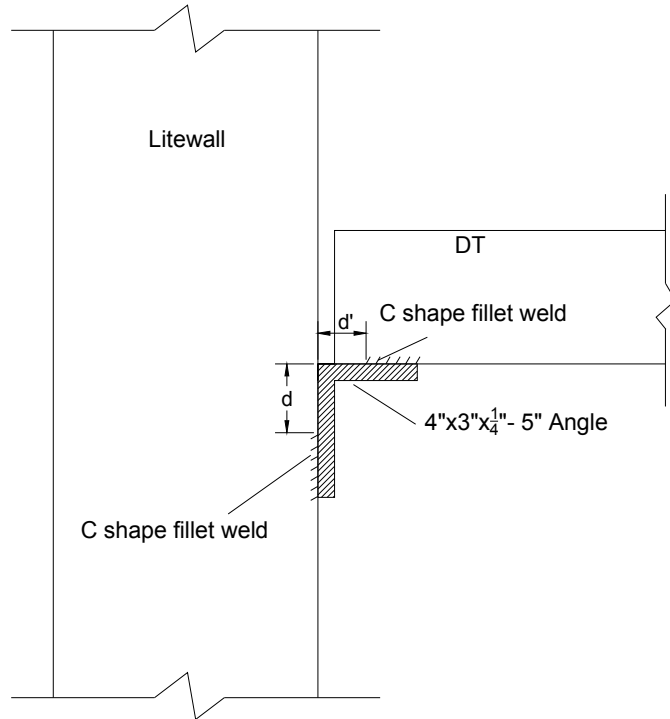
Flexible angle with C-shape welding.
